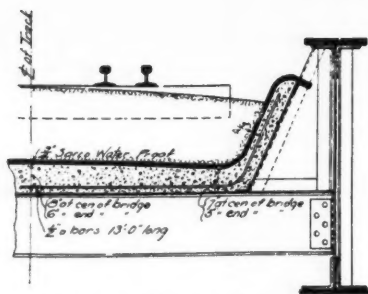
L. S. & M. S. METHOD OF WATERPROOFING BRIDGE FLOORS.
